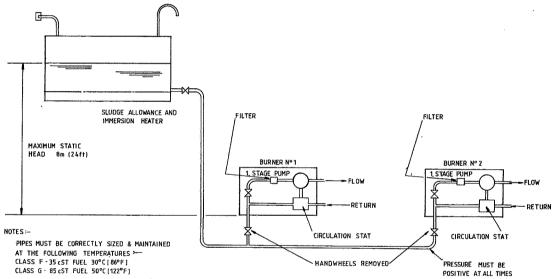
GRAVITY FEED OIL SUPPLY SYSTEM FOR RESIDUAL OIL BURNER.
